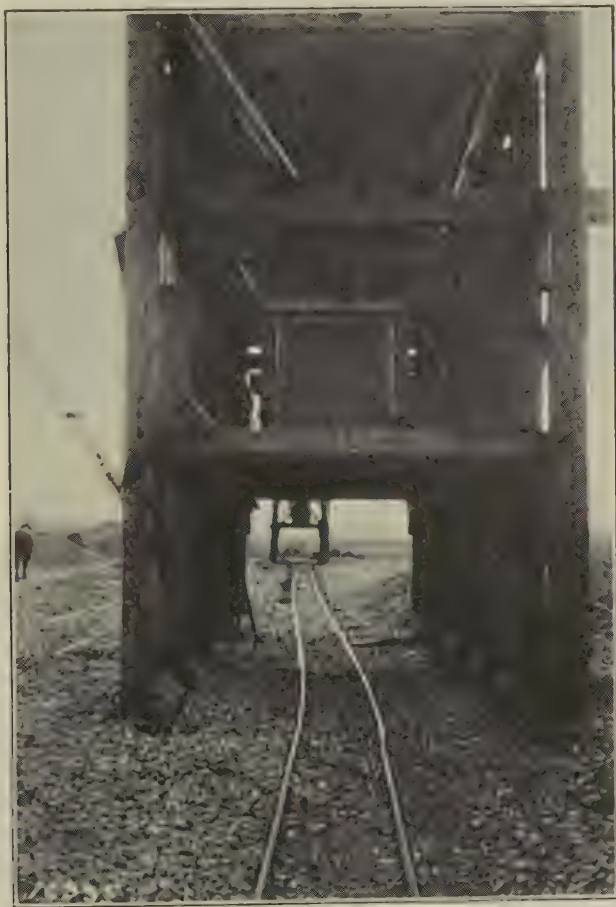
INDUSTRIAL RAILWAY PLANT, NORTHERN STATES CONTRACTING CO., BUCHANAN CO., IOWA.
